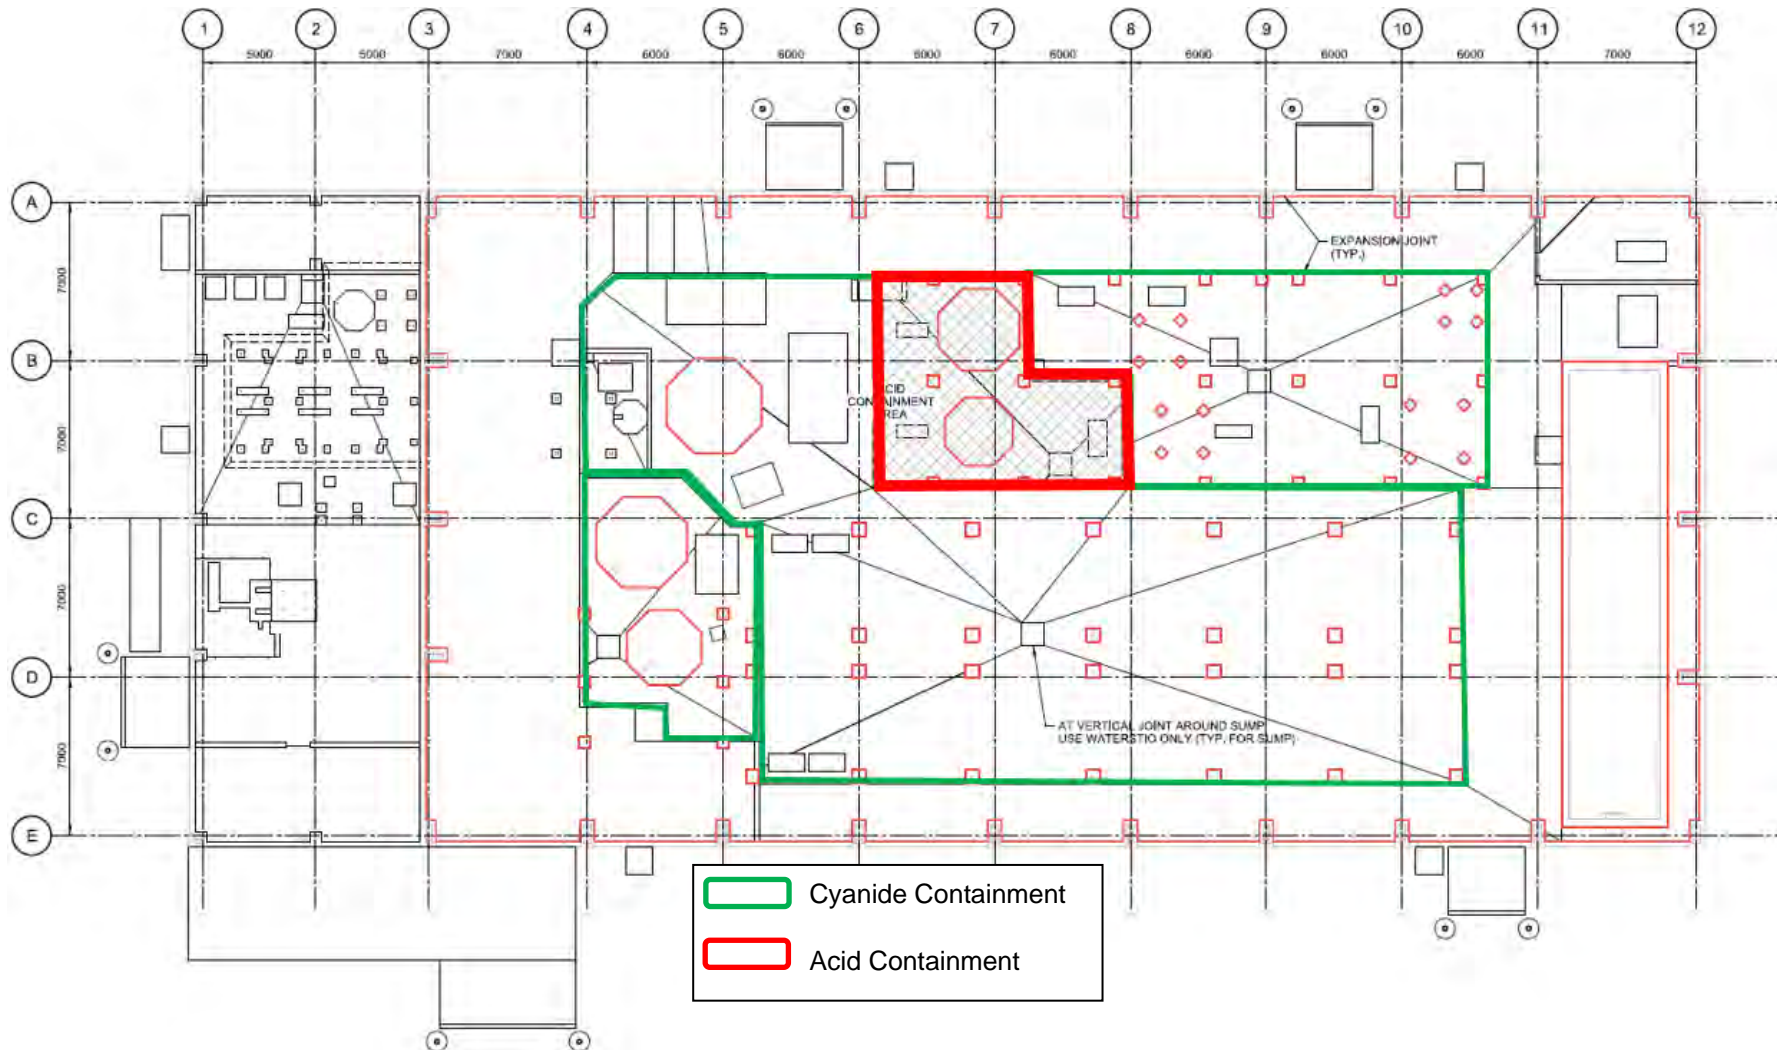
Cyanide Storage and Mixing Area Containment
